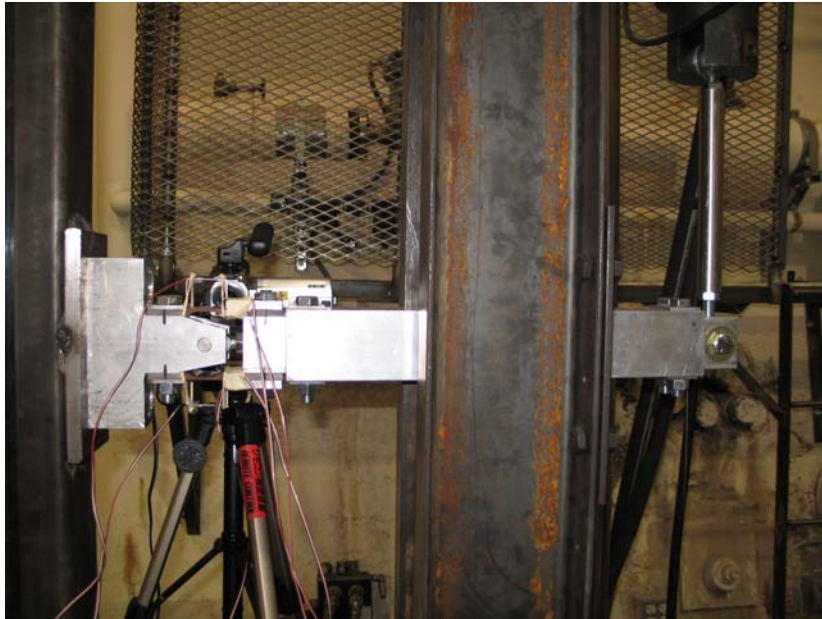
Cantilever subassembly after installation (Specimen type A)
